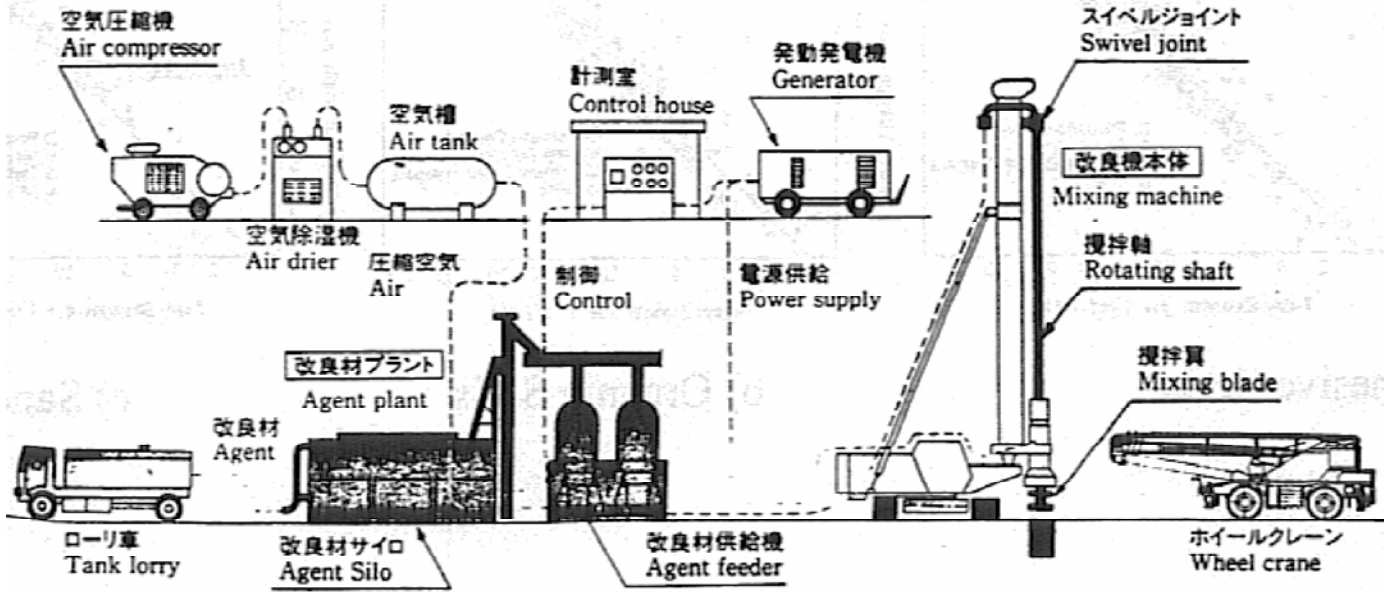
Details of DJM equipment (DJM brochure, 1996).
